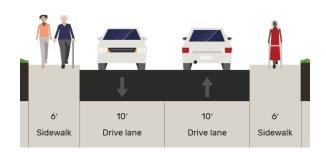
ACCEPTABLE LOCAL STREET TYPICAL CROSS-SECTION - SHARED STREET
